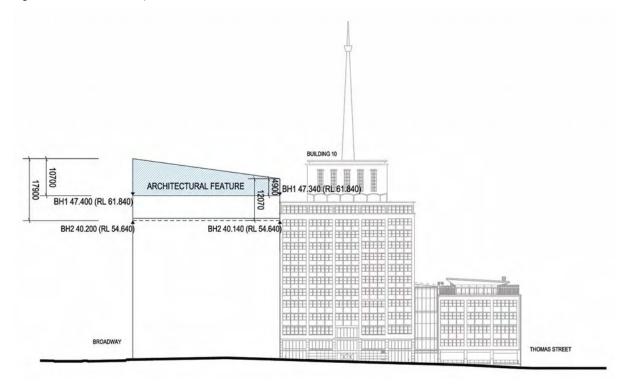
East (Jones Street) elevation of architectural feature (Source: DCM)
